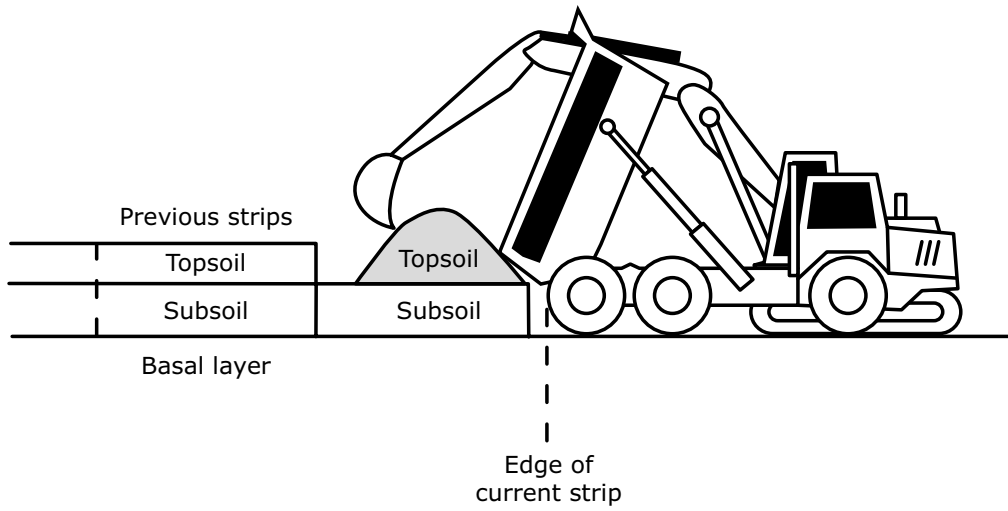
Soil replacement with excavators - dump trucks: Topsoil layer.
